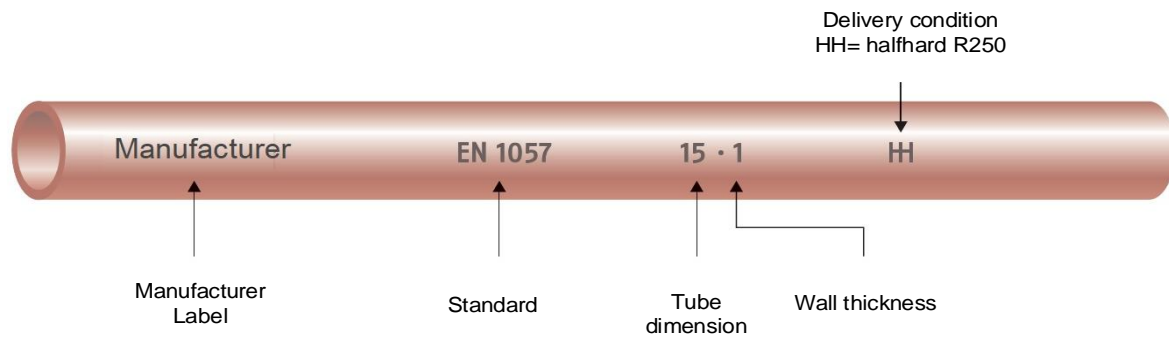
Manufacturers tube marking (Source: Heat GmbH)
